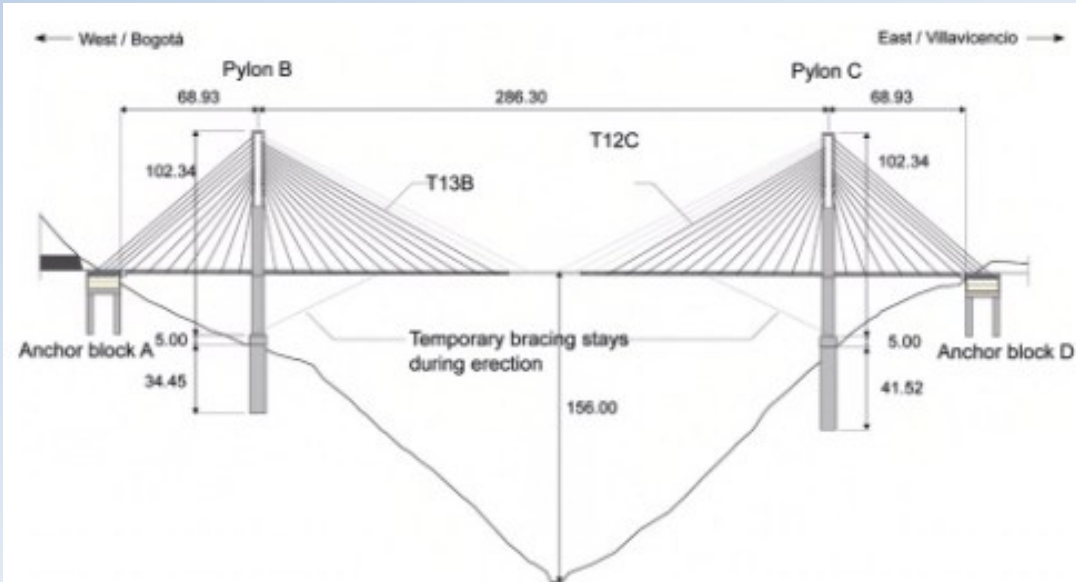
General dimensions of the Chirajara Bridge. Members of the main span (cable + girder) shown in light grey shading had not yet been erected at the time of the collapse of Pylon B
